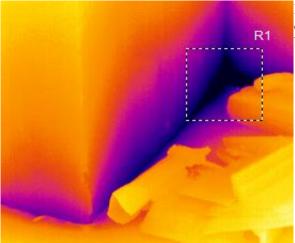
Thermal image of a corner connection of a residential apartment on the 1st floor of a building
